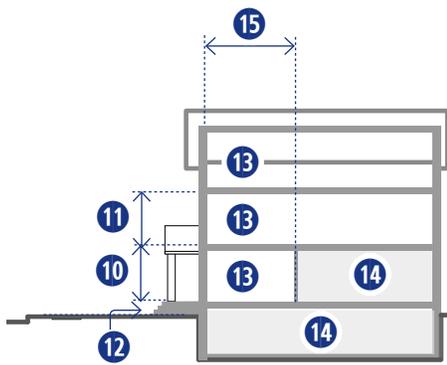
Townhouse Building: Floor-to-Floor Height & Use Requirements
